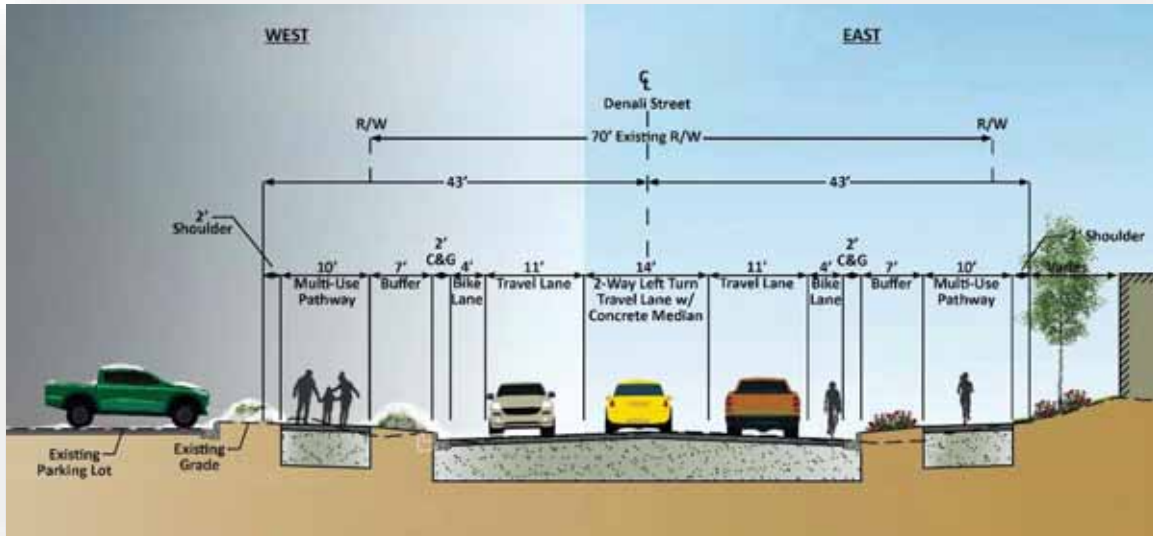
Denali Street (36th Avenue to Benson Boulevard) – Alternative 1
